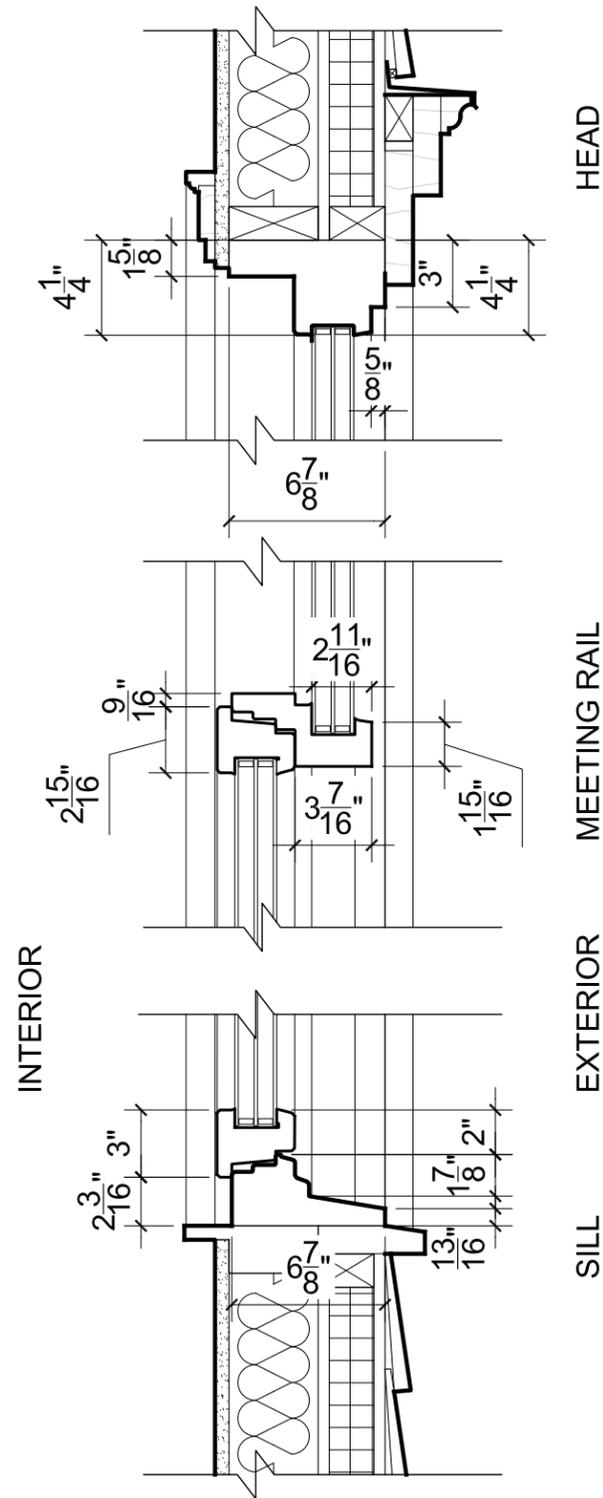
DETAILED WALL SECTION AT REPLACEMENT WINDOW
